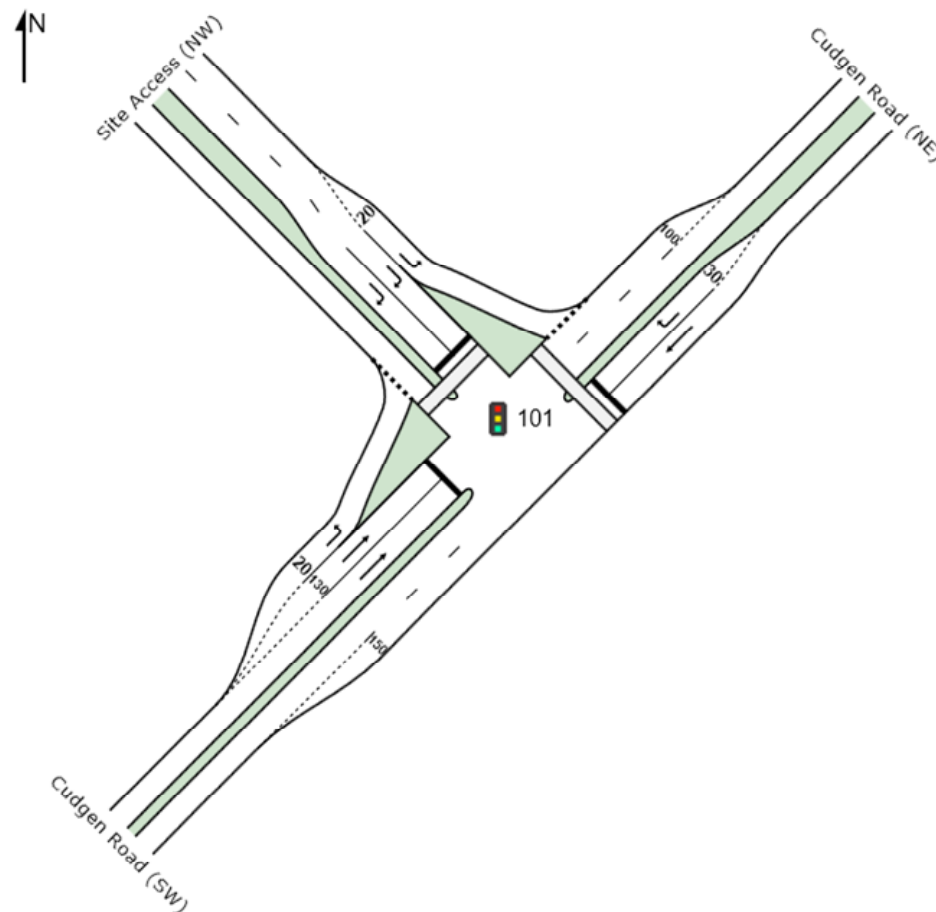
Cudgen Road / Site Access SIDRA Intersection Layout
